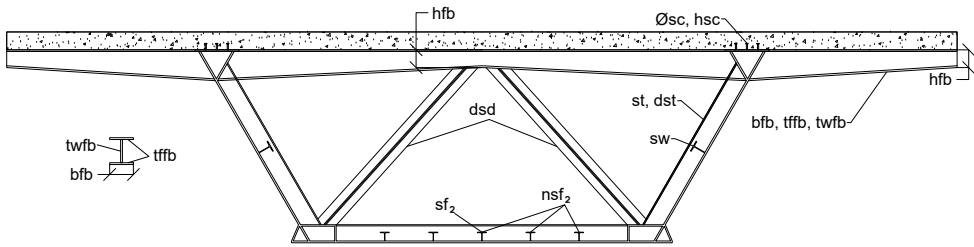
SCCB structural optimization stiffeners and floor beam variables
